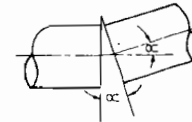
DETAIL OF PIPE CONDUIT SECTION ON E-A2 CRADLE SHOWN
